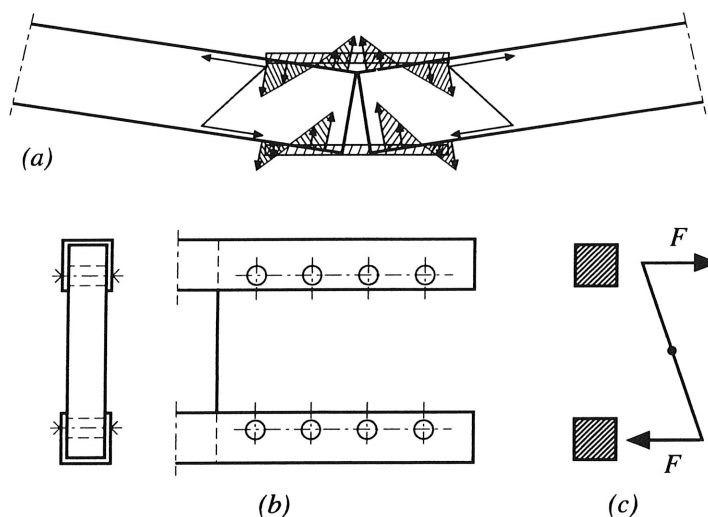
Splitting failure due to stiff steel channels used to connect the beam ends.
